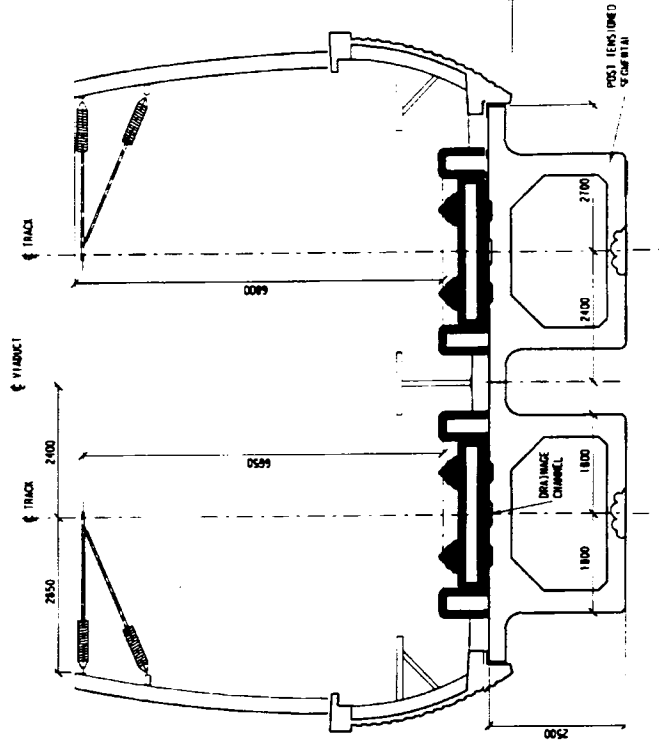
TYPICAL CROSS SECTIONS OF TWIN TRACK DECKS
